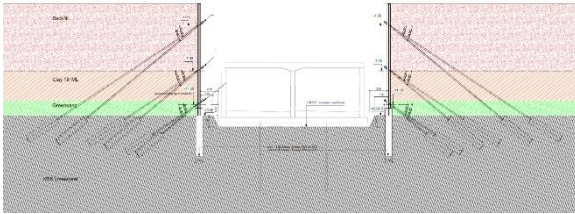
Temporary works cross-section in the marine area, illustrating the excavation pit: sheet pile wall with multiple anchor levels, grout injection, berm support of sheet pile.
